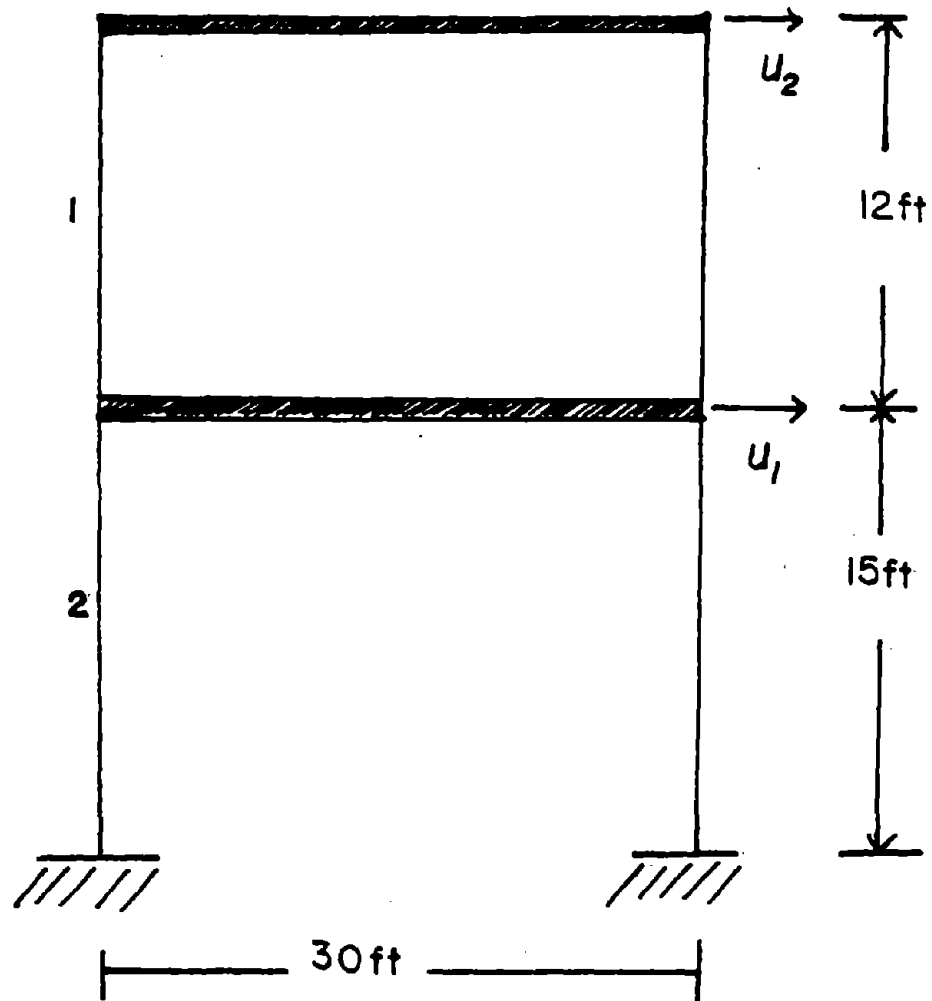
2-Story Shear Building Structure. (1 ft = 30.48 cm)
